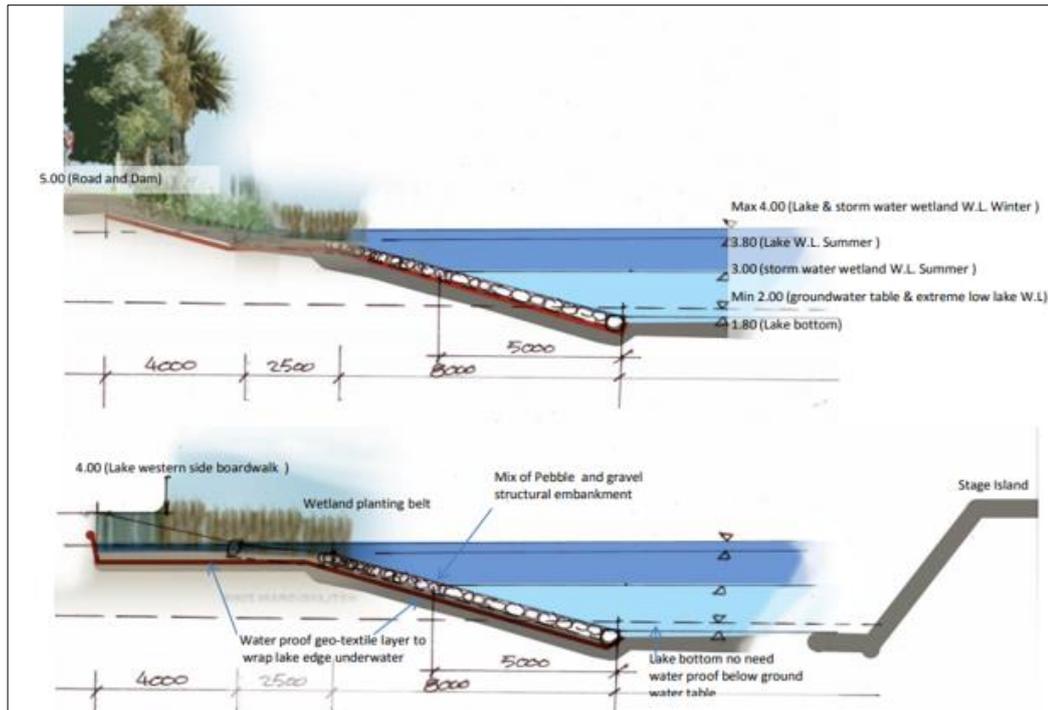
Typical Lake Cross Sections showing the proposed works in RC 2 (source: Tata Valley Ltd)
